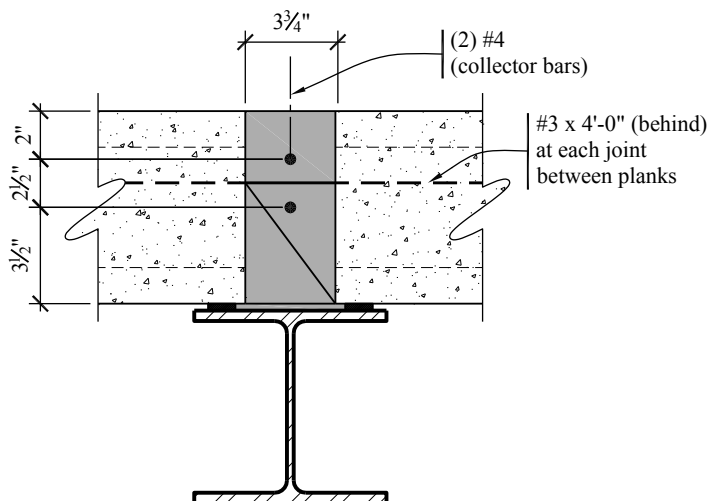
Interior joint reinforcement at the ends of plank and collector reinforcement at the end of the interior longitudinal walls - Joints 1 and 5
